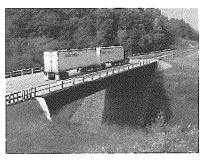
Berkshire over Muitzes Kill Bridge
